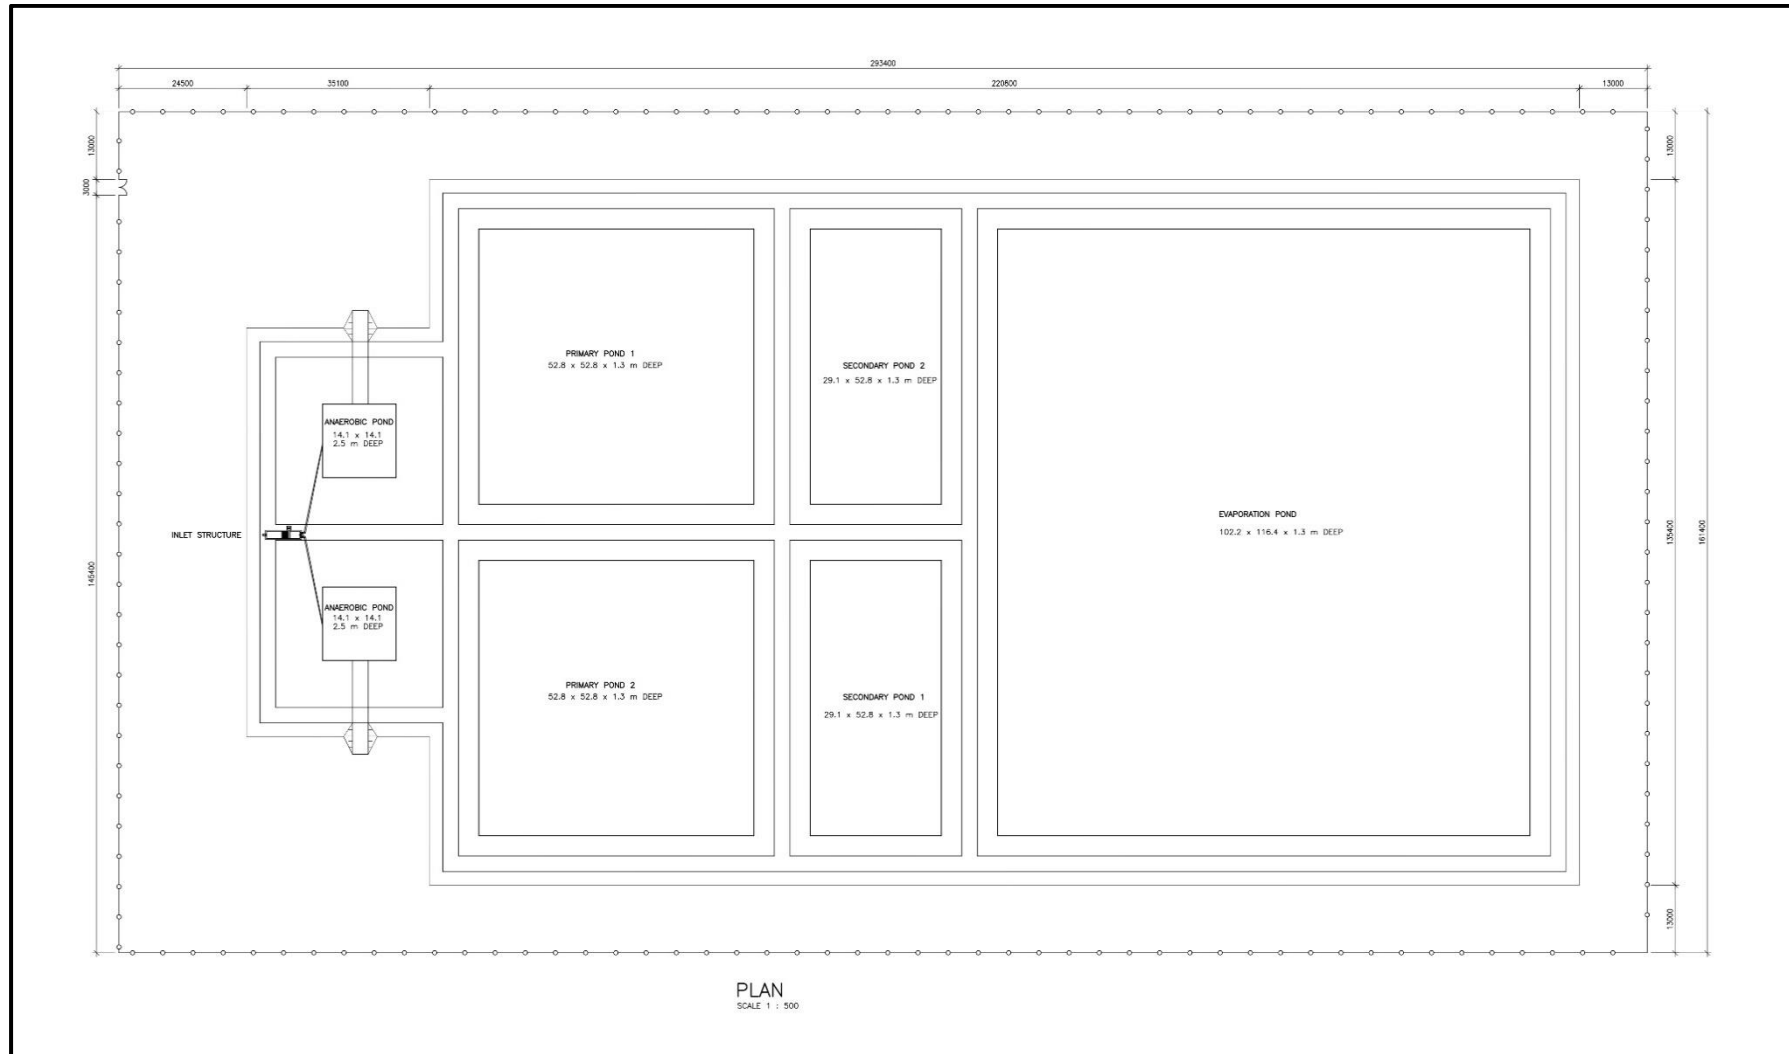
The proposed drawings (site layout) of the oxidation ponds (Source: The Proponent, 2020)
